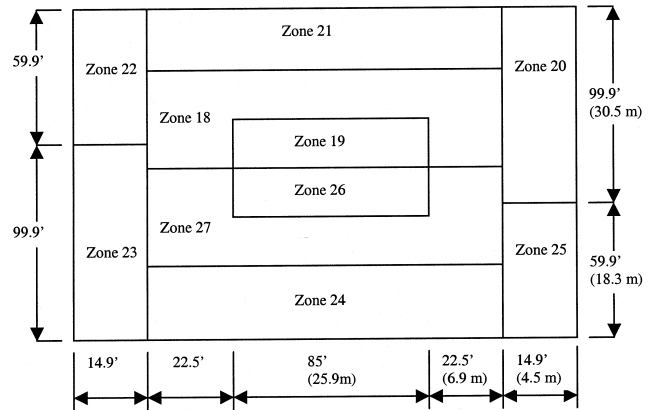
Zone layout for floors 8 through 24 of the large office building.
